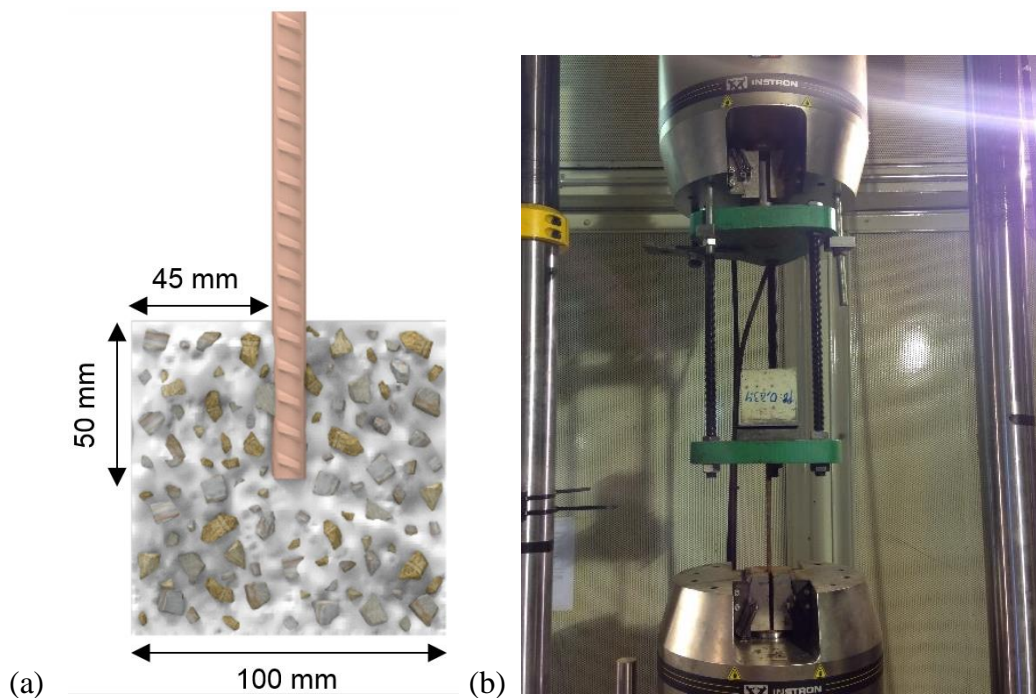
(a) Concrete specimens description (Phase 2) (b) Pull-out test setup
